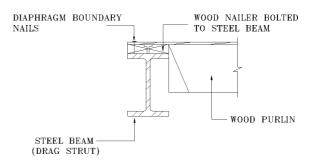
Typical detail for transfer of shear from plywood to the drag strut
